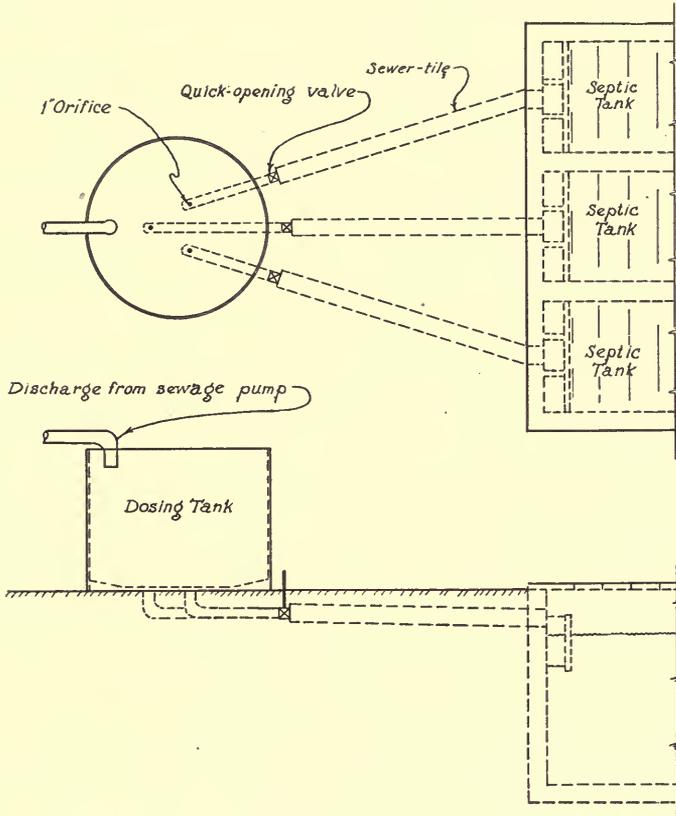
PLAN AND ELEVATION OF THE DOSING APPARATUS
